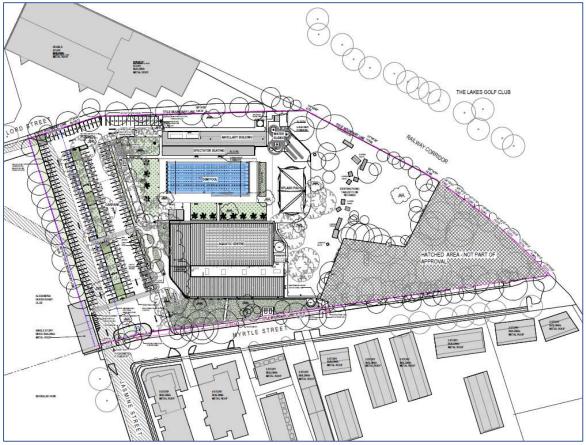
Excerpt of Site Plan (Source: CO.OP Studio, Revision D)
